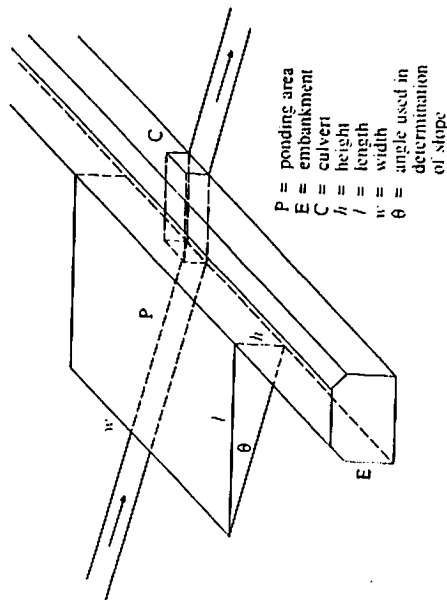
Schematic representation of wedge-shaped ponding area with box culvert outlet. (Source: Craig and Rankl, 1978. Used with permission.)
